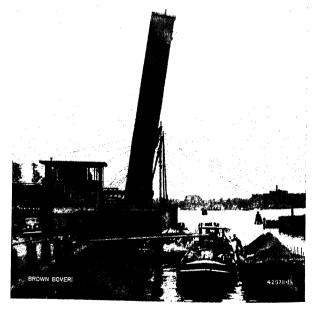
View of the rolling leaf bridge at Oosterdoksluis, belonging to the Dutch Railways.
